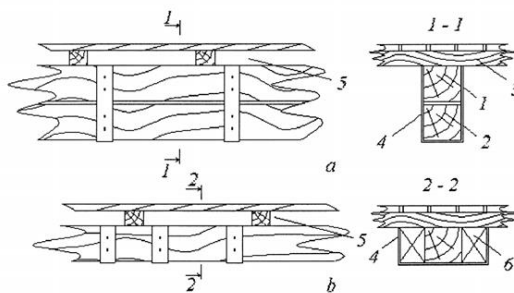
Beam strengthening using wood and steel elements [14]:
